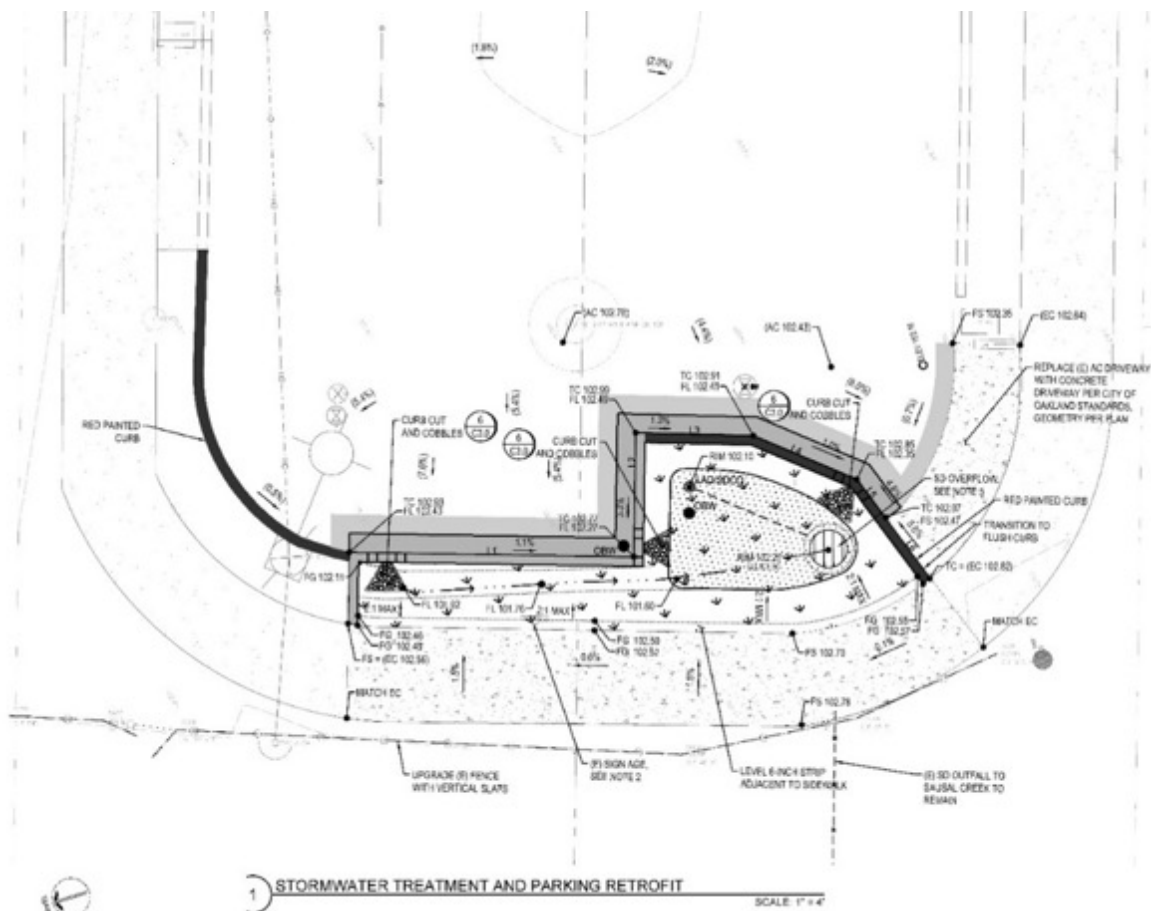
Permitted stormwater bioretention facility design. Credit: Sherwood Design Engineers
